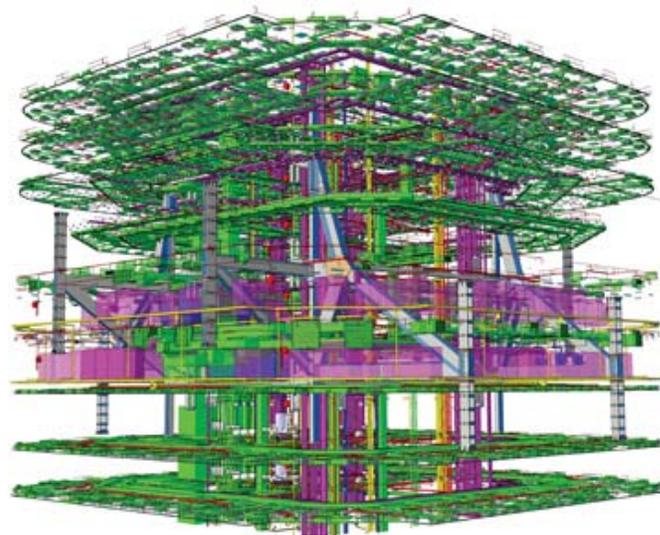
A section of the BIM model for One Island East tower in Hong Kong, Gehry Technologies' project with structural engineers, Arup. The drawing shows several floors of a mechanical zone halfway up the tower. HVAC systems are green; plumbing and electrical are purple and blue, respectively; and steel is gray. (The Architects Newspaper 2006)
